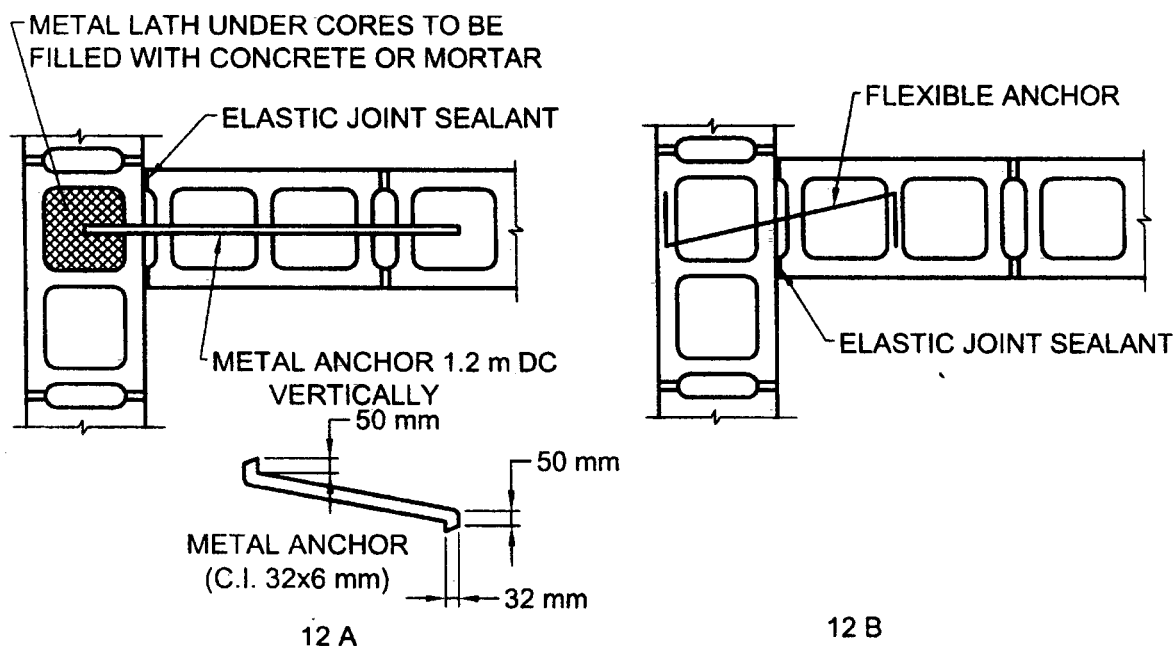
FLEXIBLE CONNECTIONS FOR INTERSECTING WALLS
